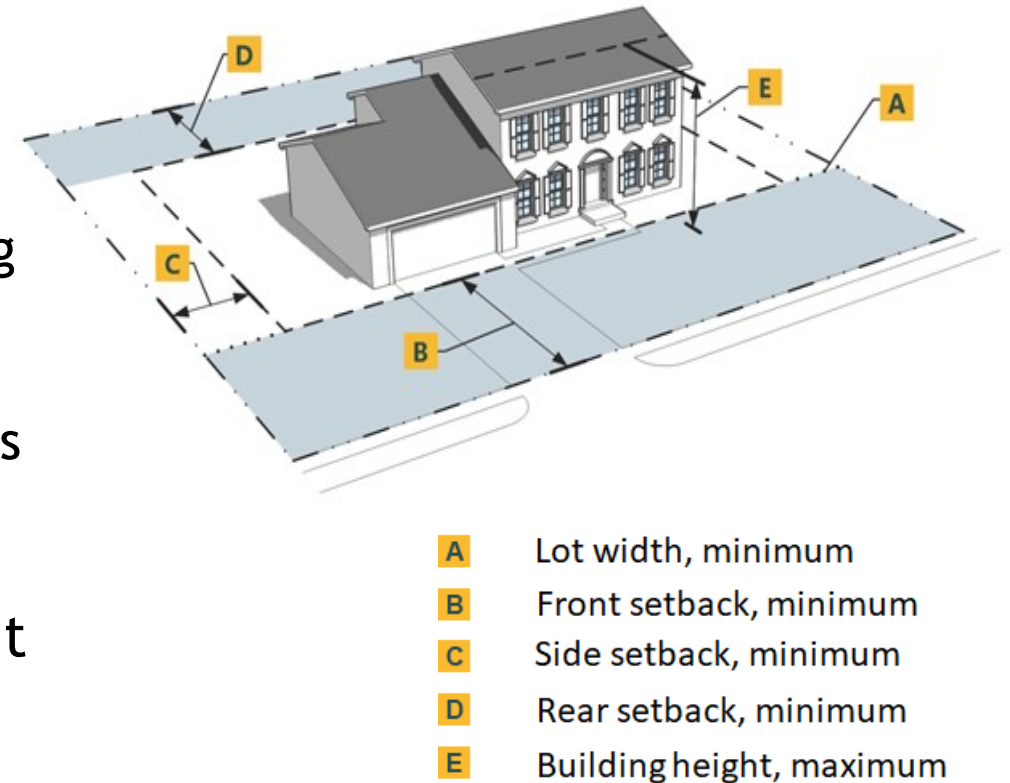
R-3 District Lot and Building Dimensional Standards
